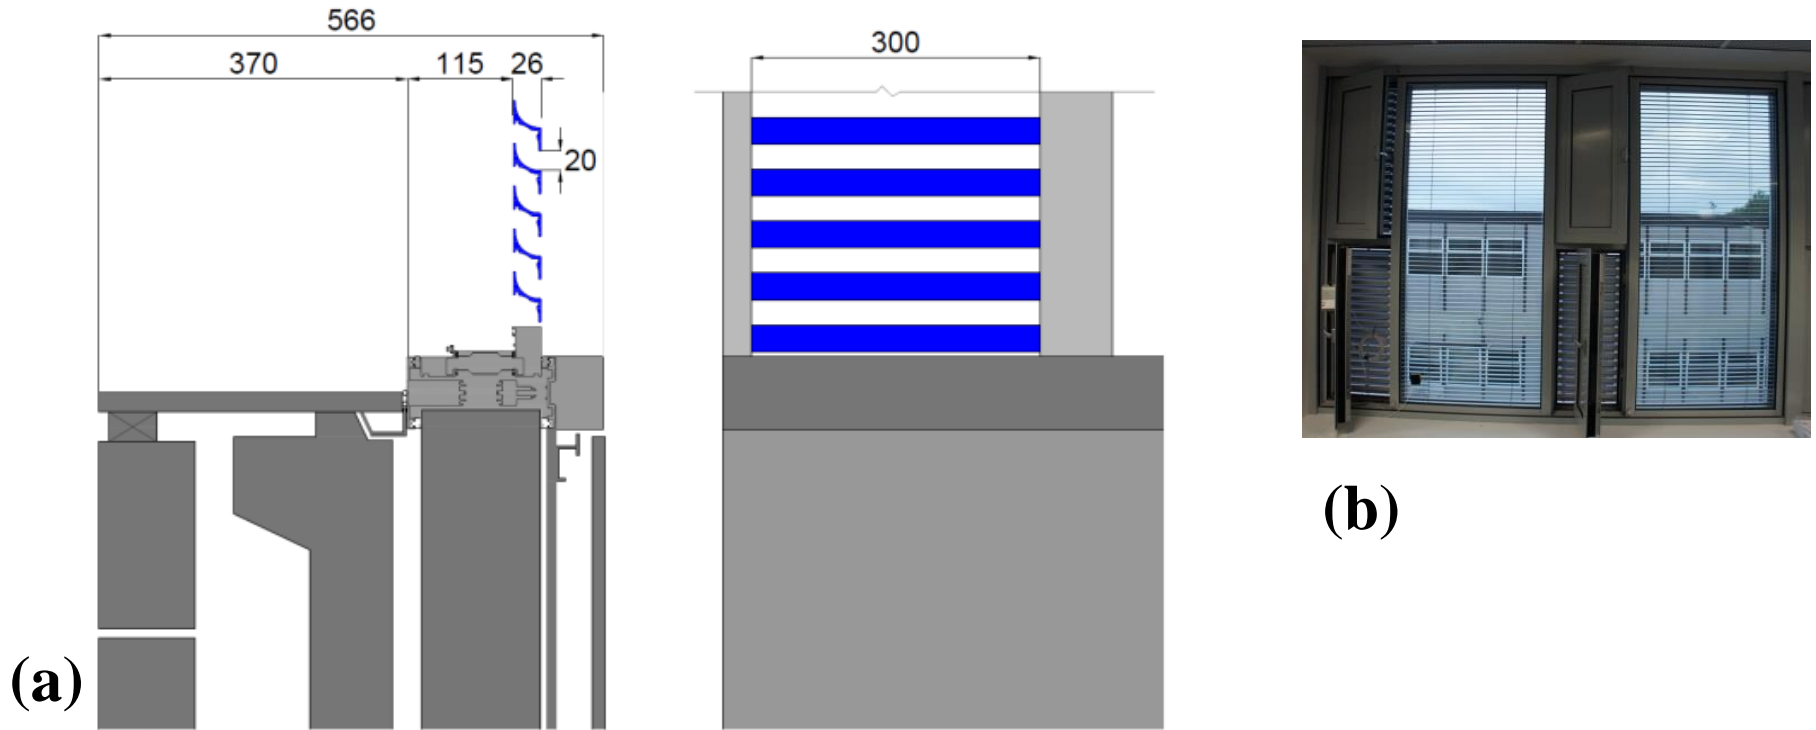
(a) Ventilation Opening detail elevation & section, (b) Internal view of installed fenestration module
